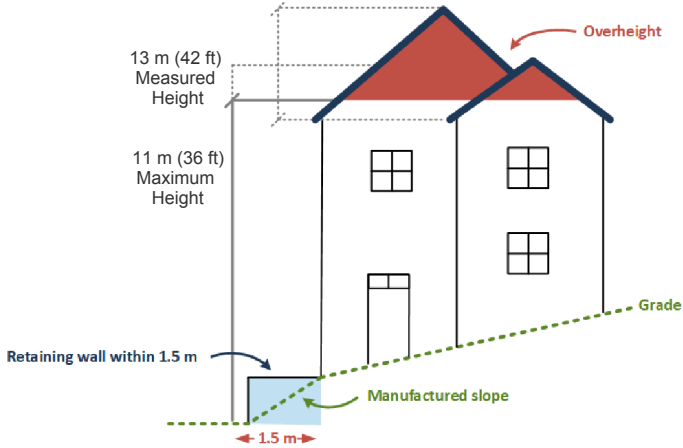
Single Detached Dwelling with Retaining Wall or Manufactured Slope Not in Compliance with Zoning Bylaw
